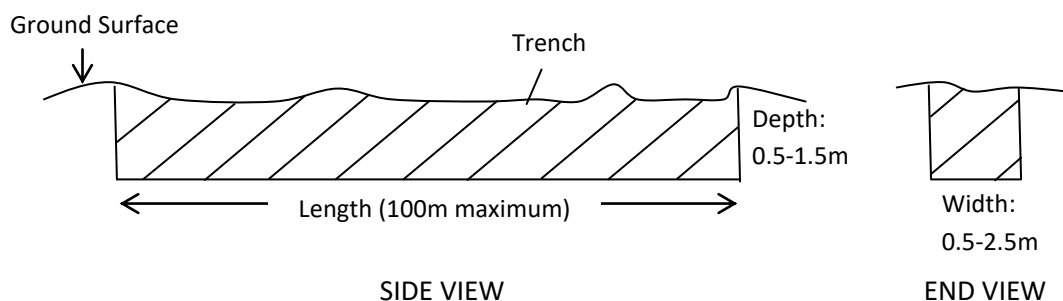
The trench method of landfill. Trenches are generally 0.5-2.5m wide 0.5-1.5m deep, and up to 100m long. The trench method is used where the ground is fairly flat or gently sloped and the soil on the site is easily excavated.
